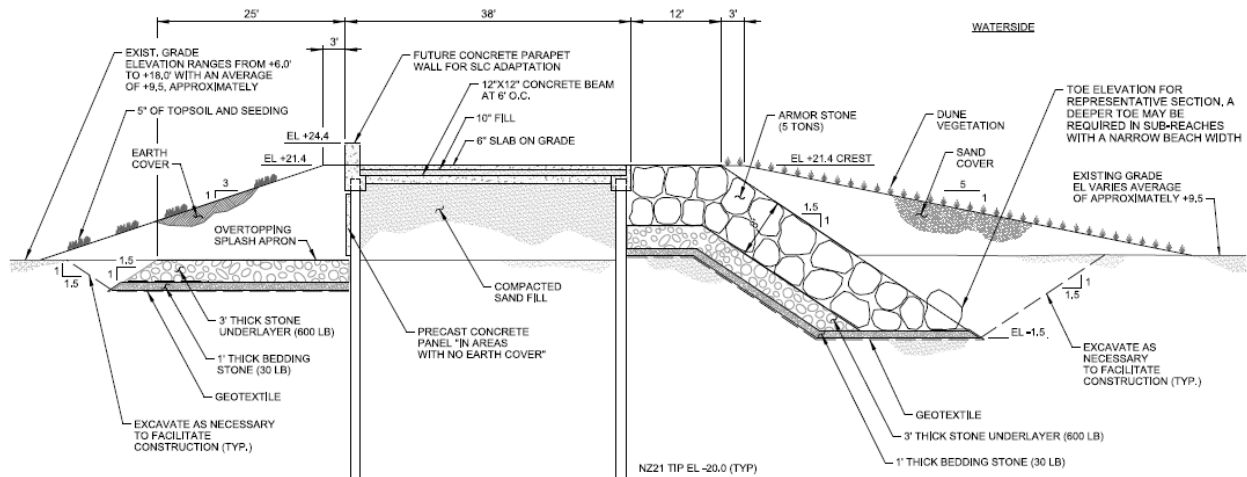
Concrete Parapet Wall atop Buried Seawall (Director's Report, 2016)
